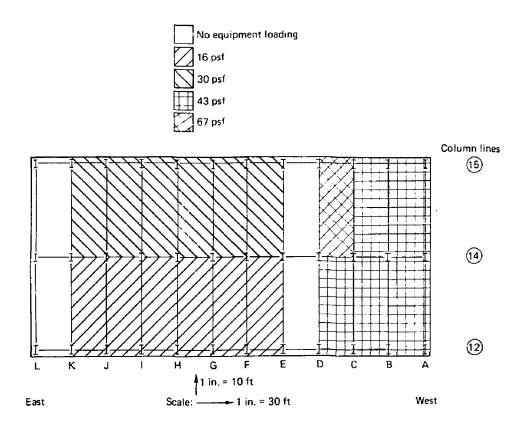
Third floor equipment loads (supplied by MFTF personnel).
